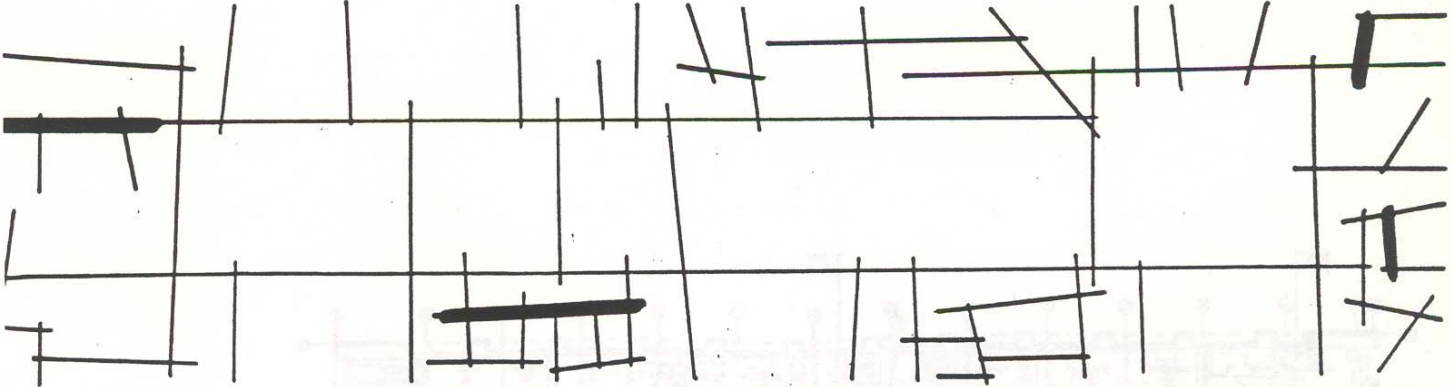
Layout of 3rd floor of British Gas showing the location of large equipment in the centre of laboratory space.
